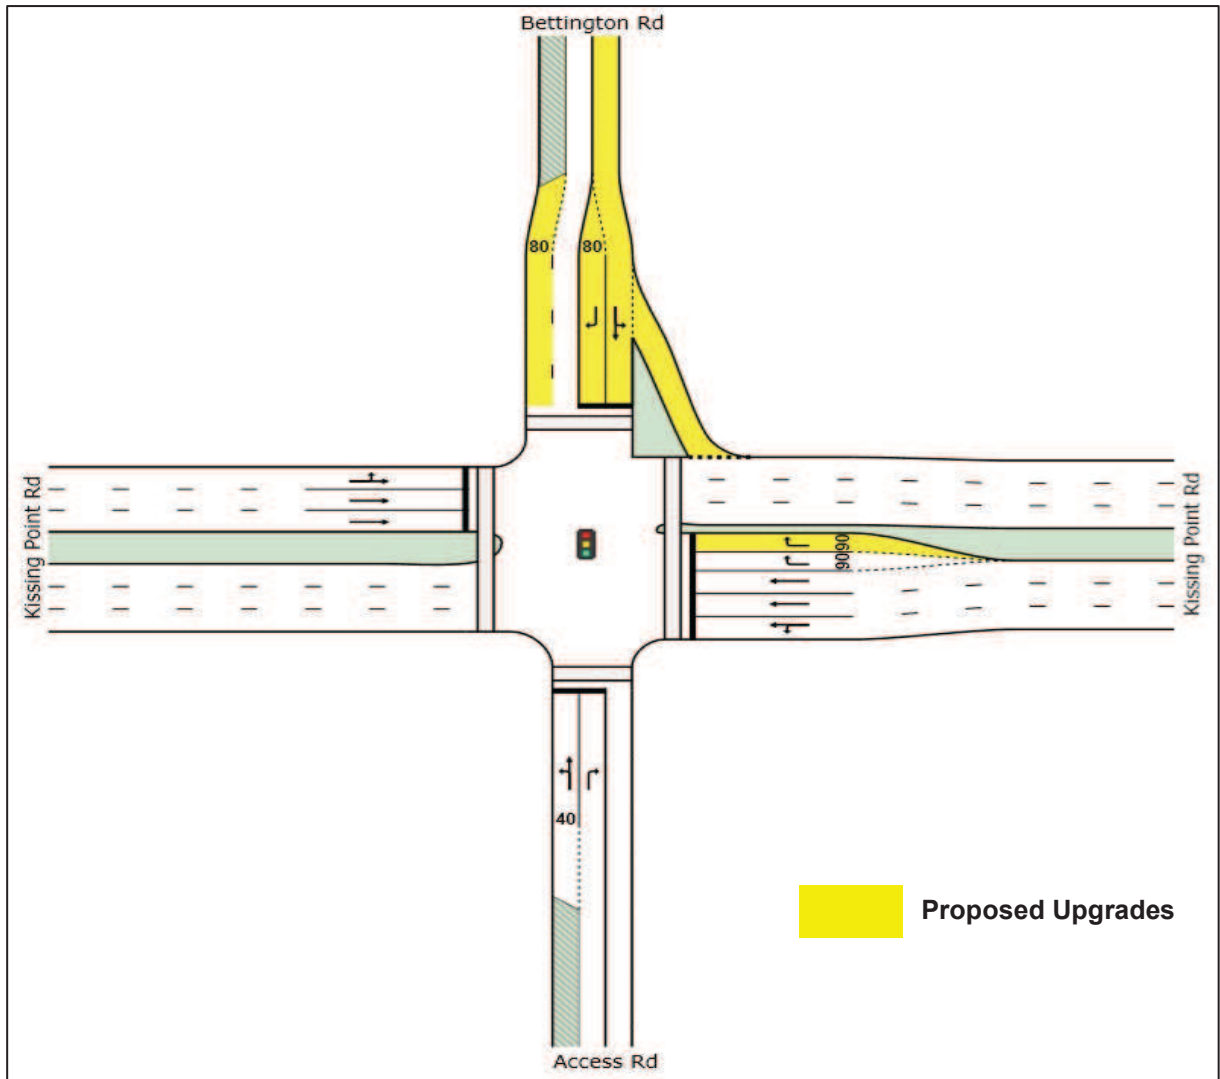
Kissing Point Rd / Bettington Rd / Site Access - Indicative Upgrade Layout
